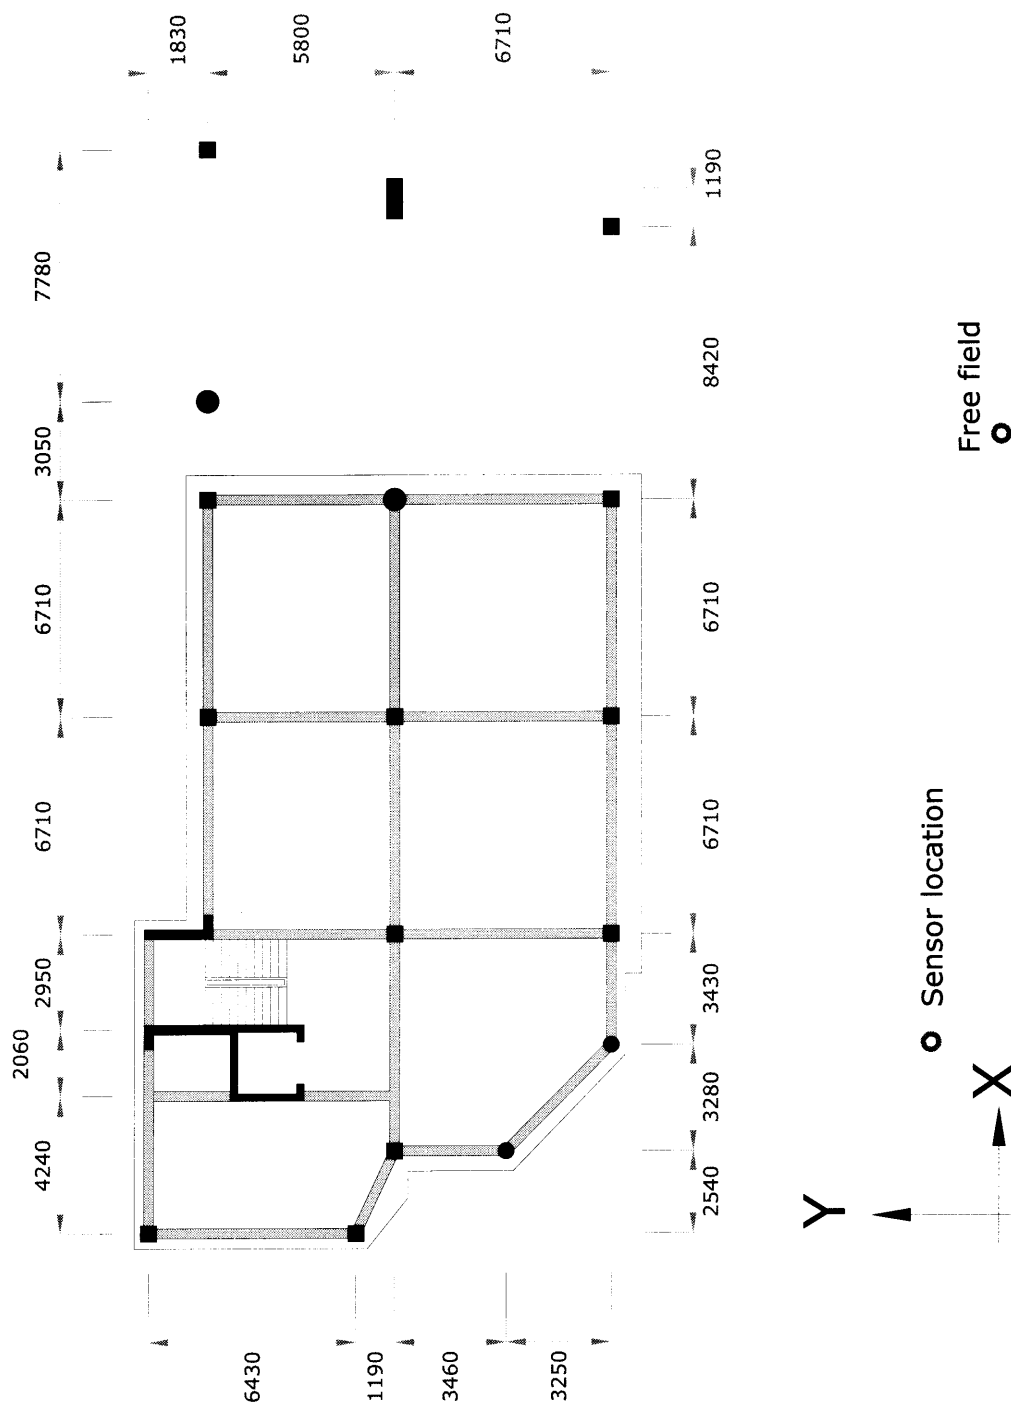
ARC Building (1<sup>st</sup> floor) Structural Element Layout (linear dimensions are in millimeter)
